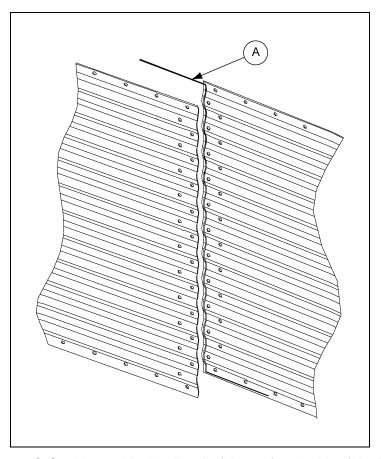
C Caulking and Bolting Details (Viewed from Inside of the Bin)
